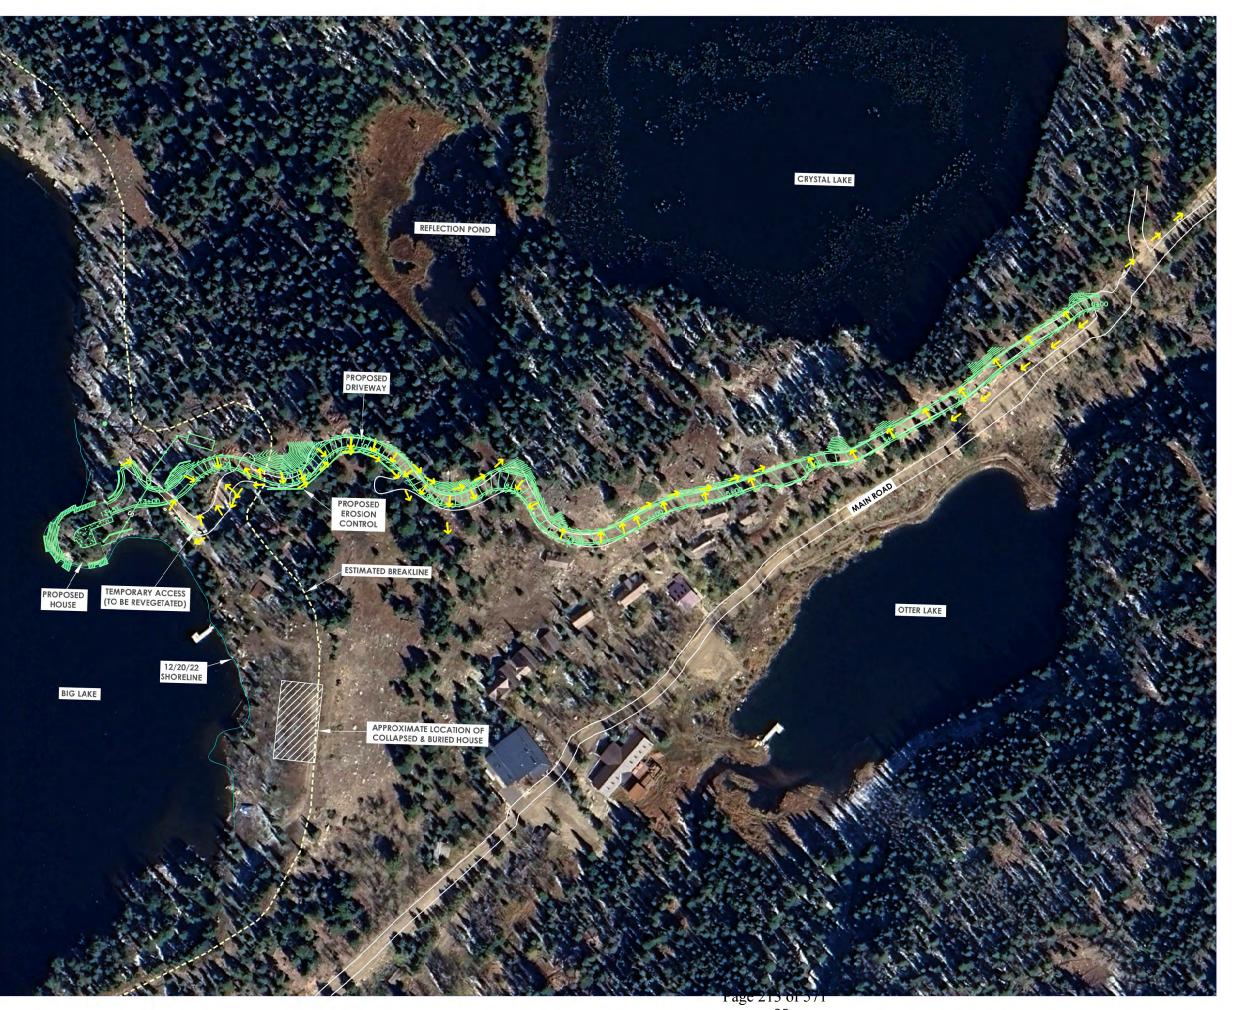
AERIAL WITH PROPOSED PLAN Big Lake Residence
